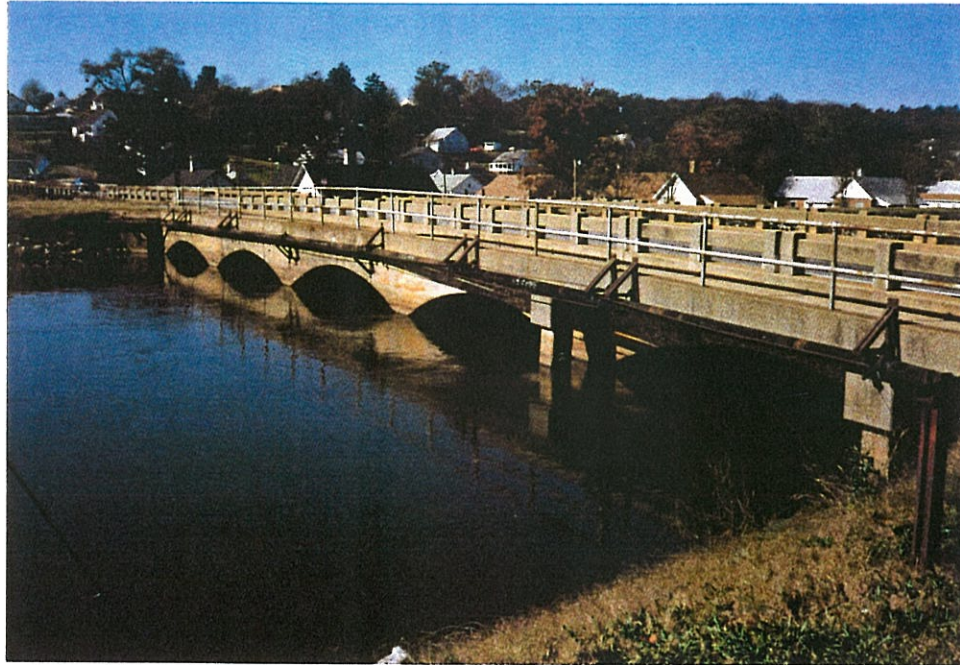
Northwest view at Route 9 bridge over canal at Lockhart.
